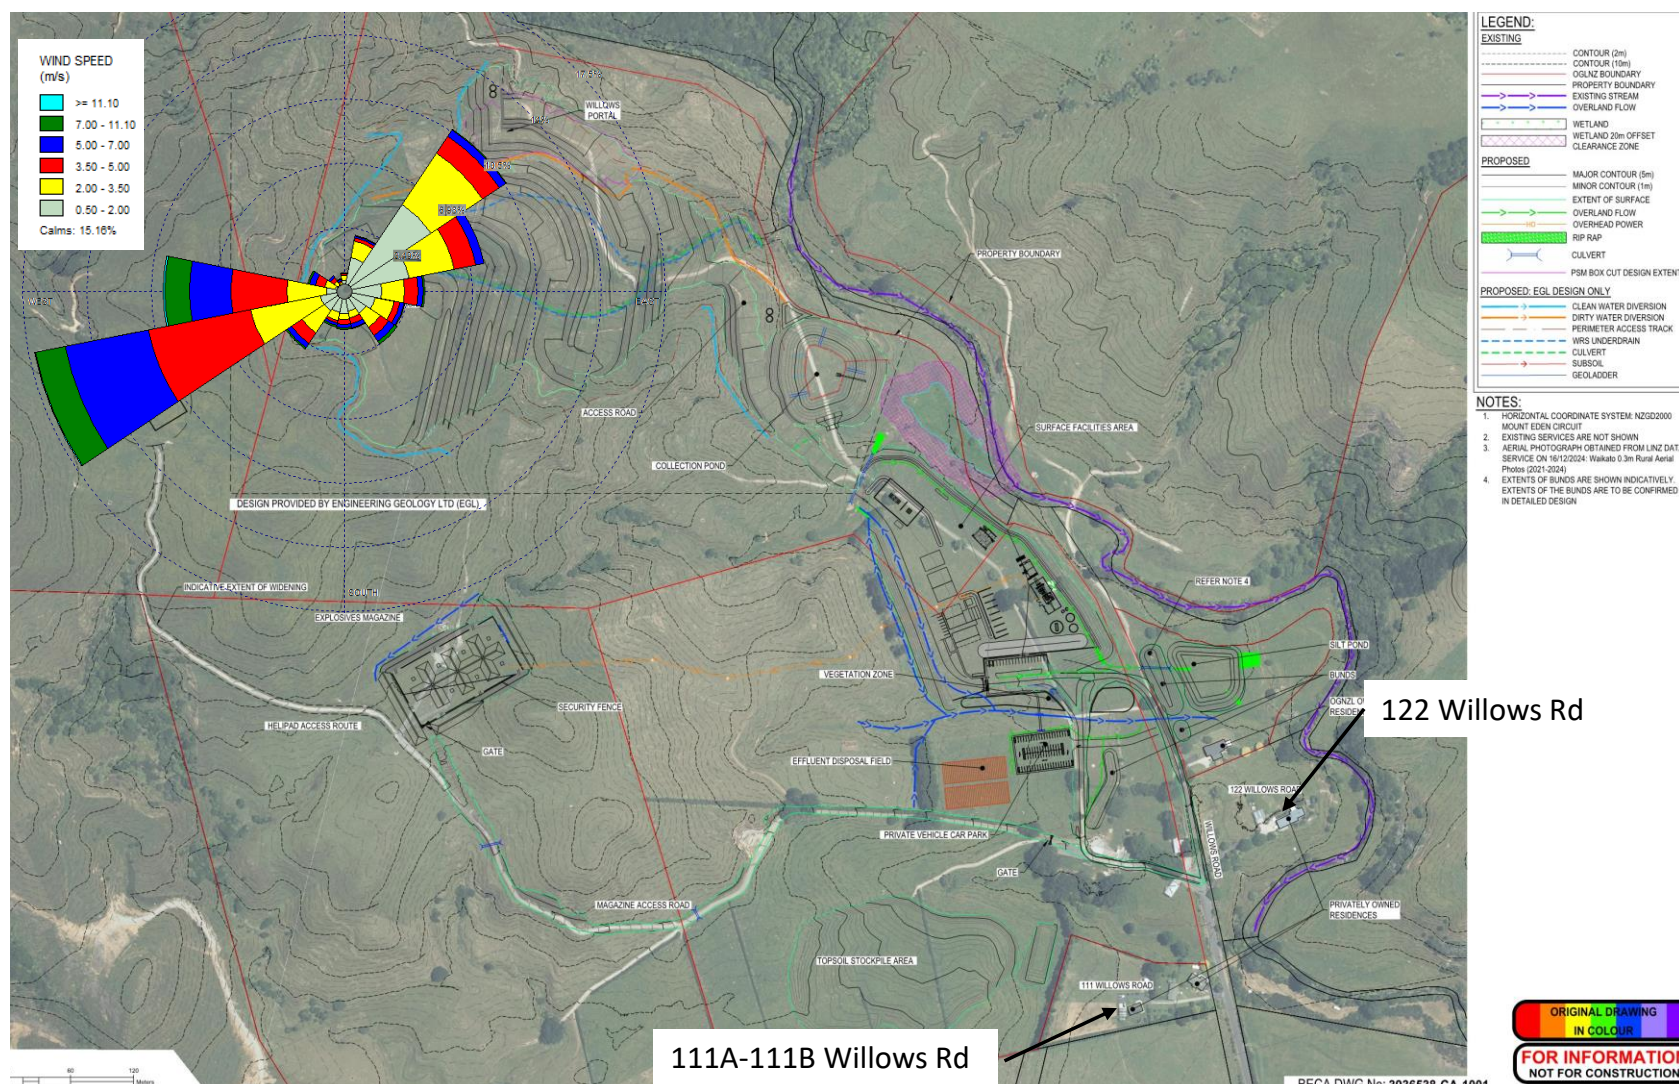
Plan showing Willows Road site layout, location of OGNZL and distances from surface infrastructure to nearest privately owned dwellings on Willows Road (with the Waihi windrose shown)
